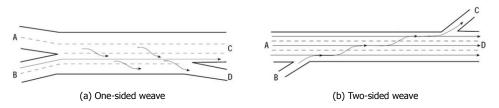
Examples of type C weaving sections [48, p. 6]
